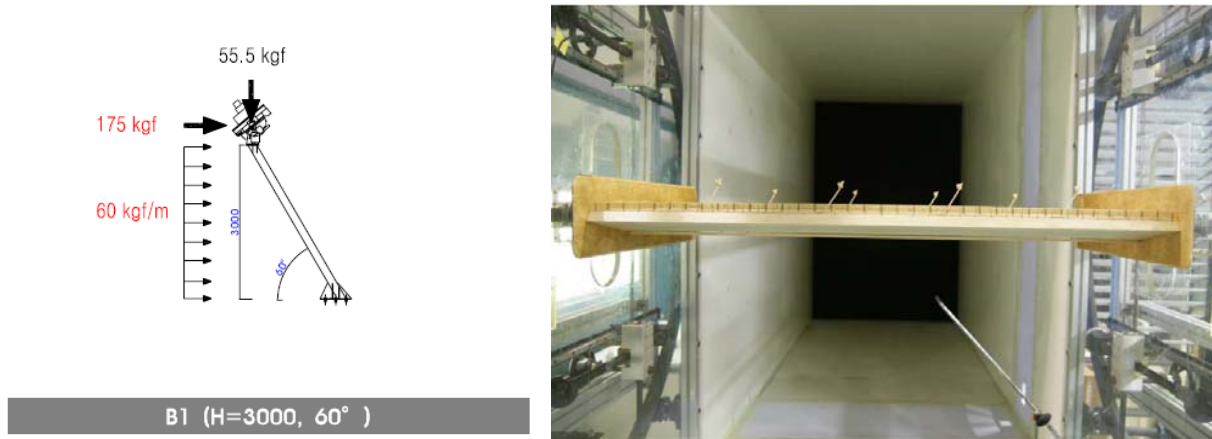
Pole Structure Calculation and Wind Tunnel Test
